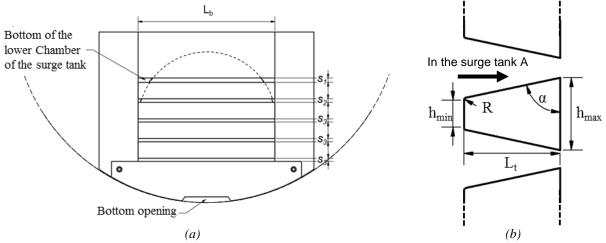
(a) Up view of the grid, the bottom opening is due to the presence of the inspection wagon rails; (b) Schematic view of beam cross section
